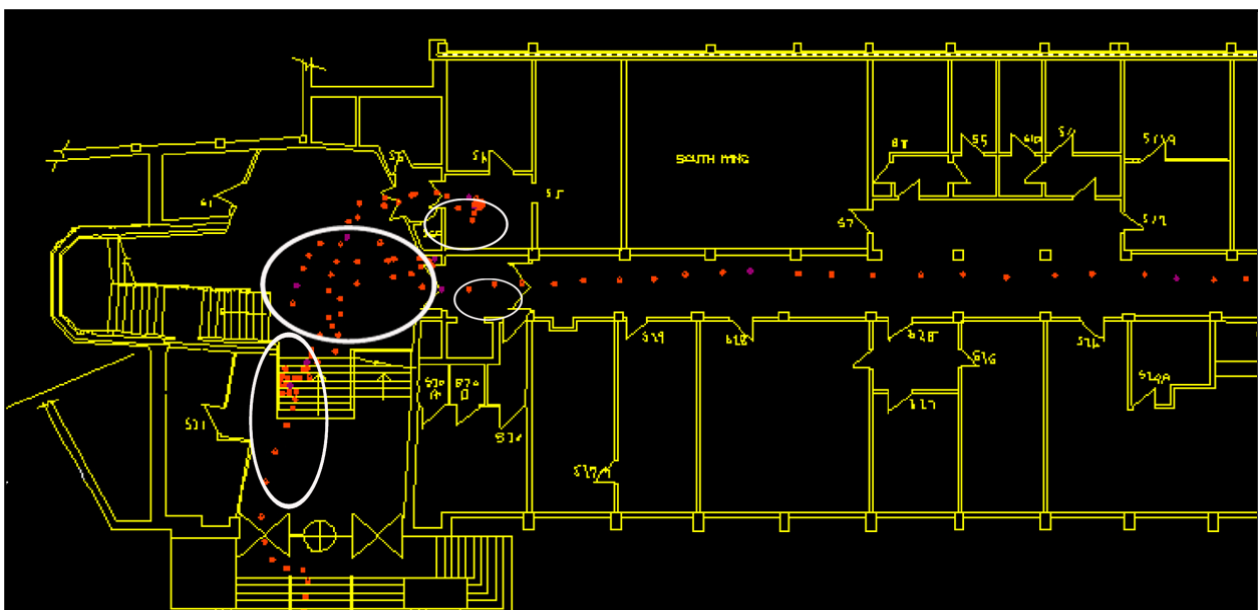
Movement Trace and Hot-spots. Example of 'movement trace' overlaid on floor plans, showing hotspots (from [8]).
